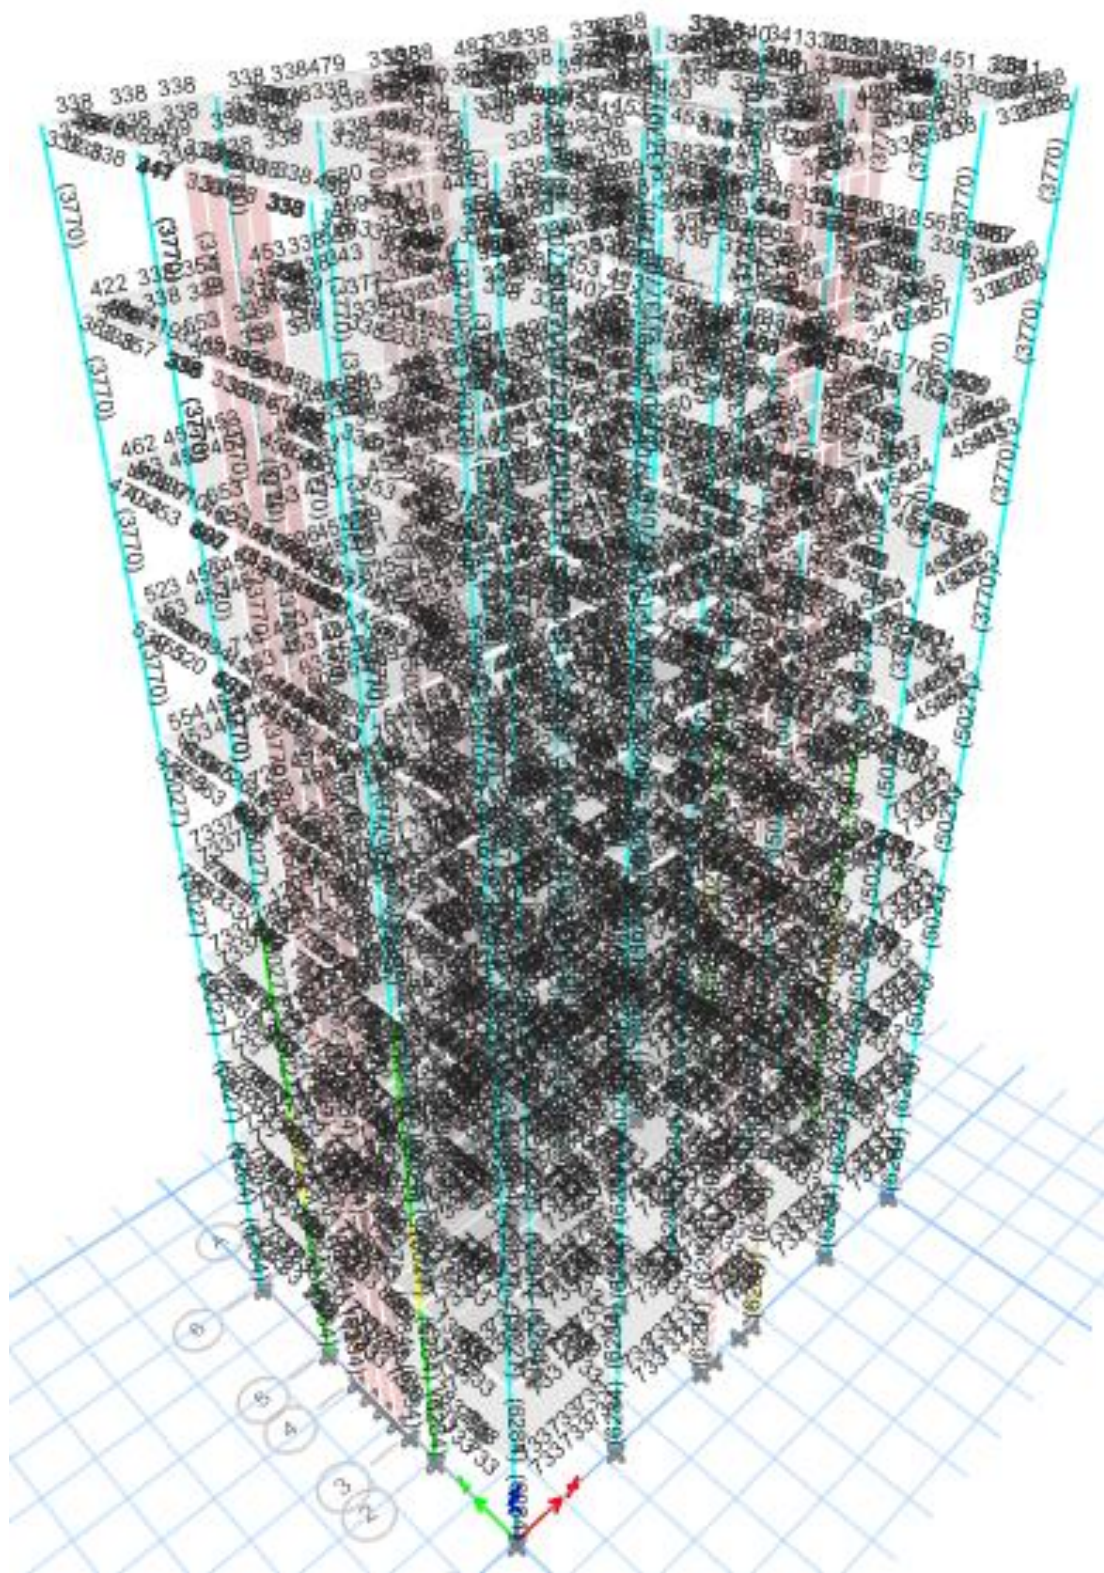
3D View of the Assigned Loads For 10-Story Building.
